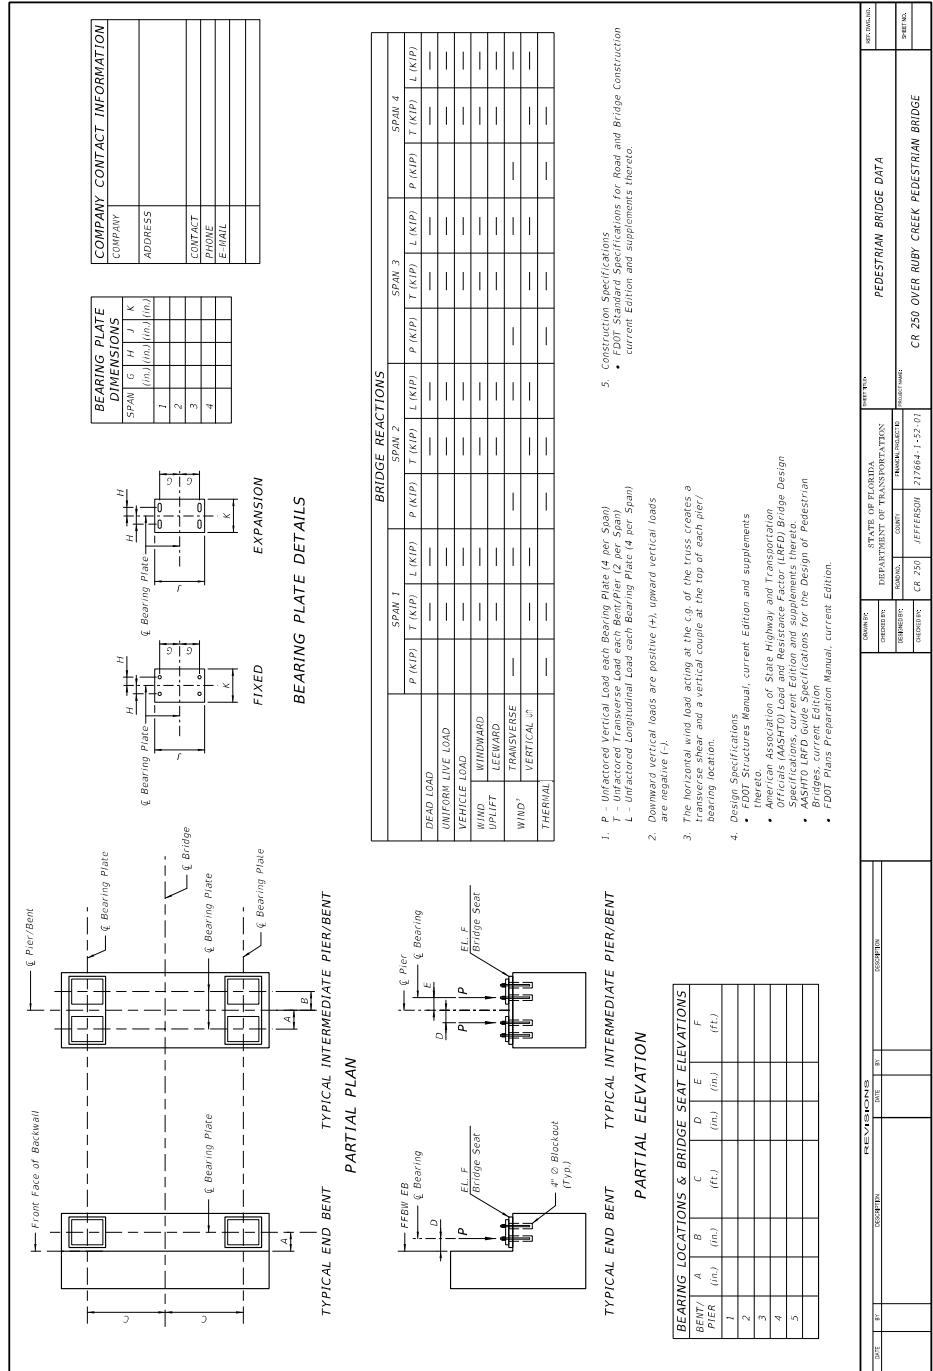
A Sample Steel Truss Pedestrian Bridge Plans, Sheet 8 of 8
